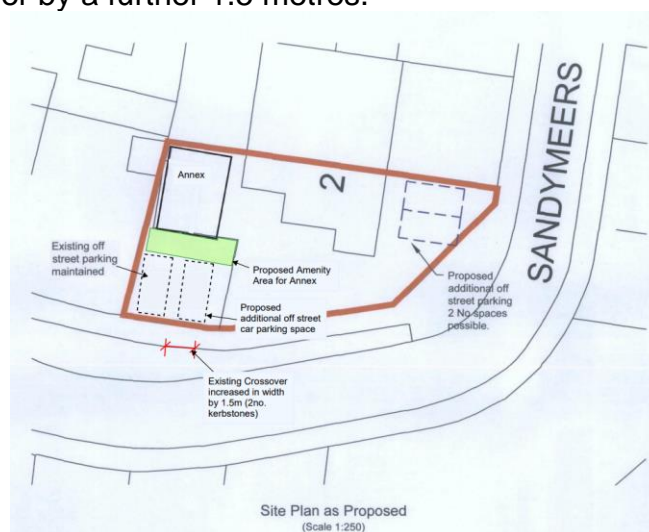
Site layout plan showing parking for 2 Sandymeers/Annexe and proposed amenity area for Annex
